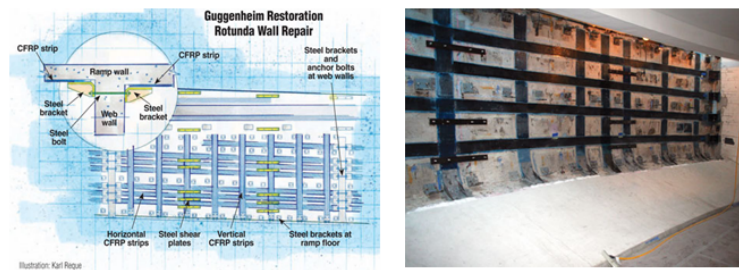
Carbon-fiber reinforcement of the walls of the sixth-floor ramp.
